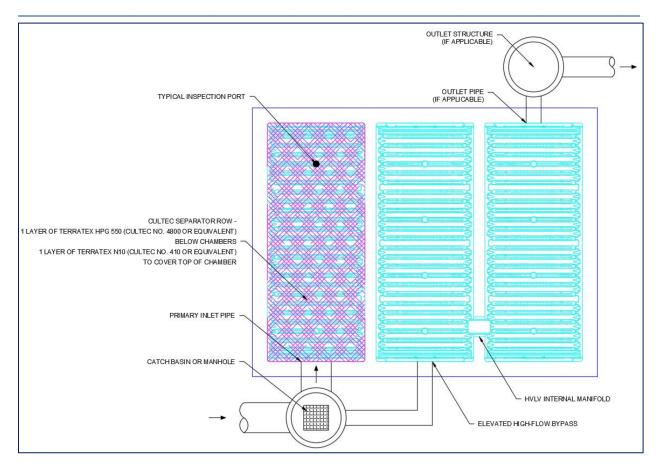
Cultec Separator[™] Row Filtration System – Plan View
